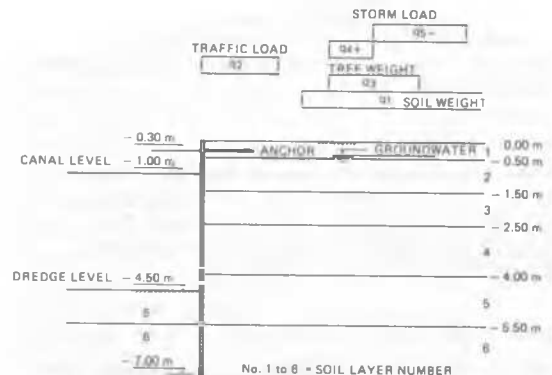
Sheet pile wall, Wessum-Nederweert Canal.
